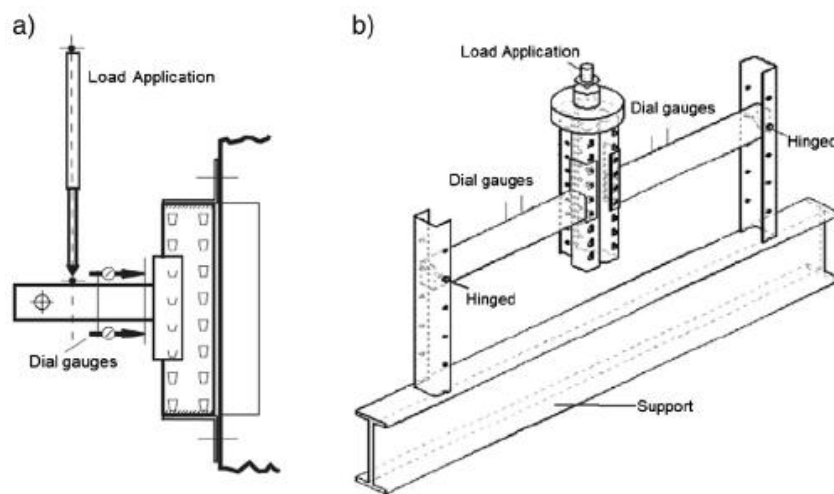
Beam end connector test setup type (Zhao *et al.* 2014)
